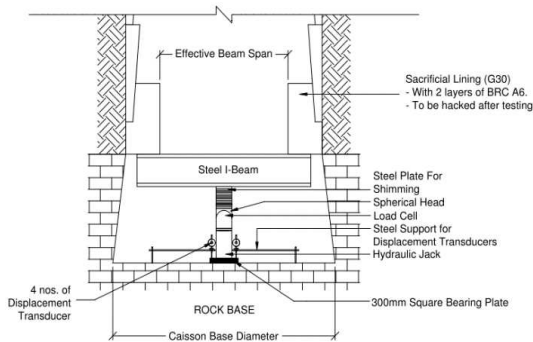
Modified caisson plate bearing load test set-up with sacrificial concrete lining
